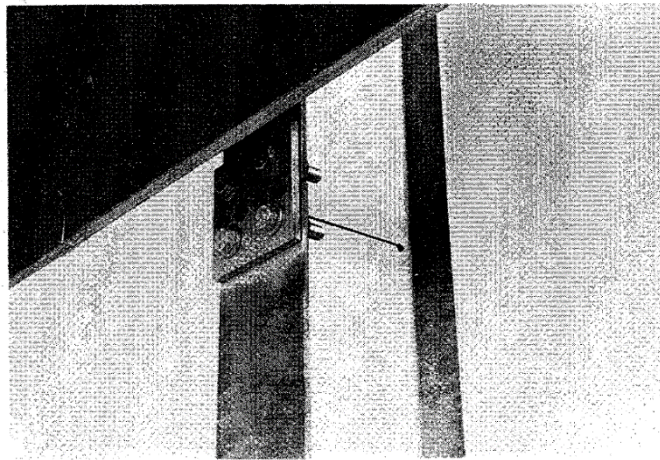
Tension Fuse Plate Installed on Sign Support (4)
